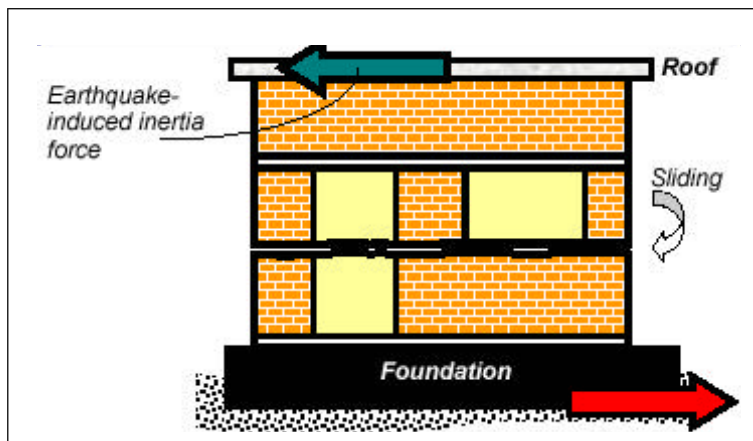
Horizontal sliding at sill level in a masonry building – no vertical reinforcement.
